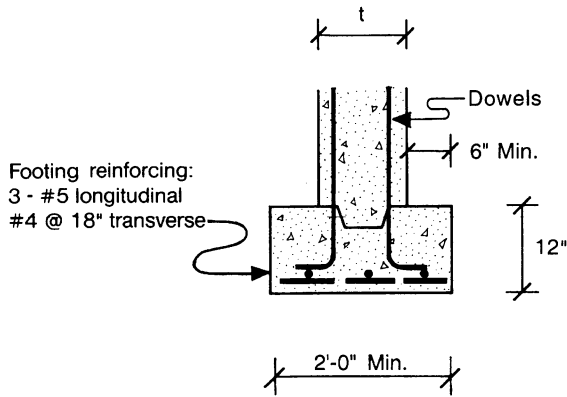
Recommended minimum size and reinforcement for wall footings.
